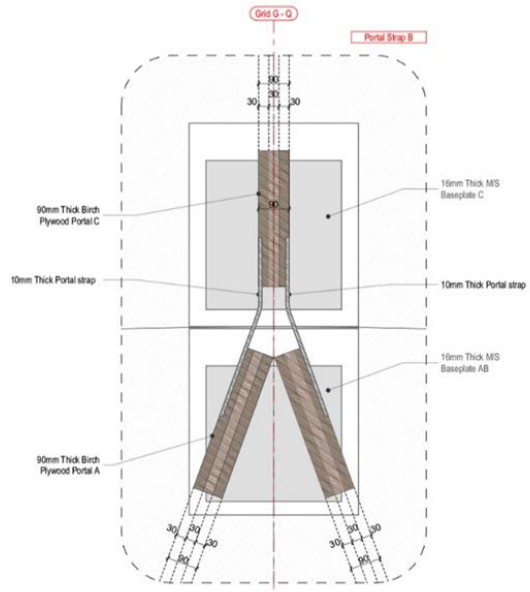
Portal frame strap detail. Drawing provided by the architects.
